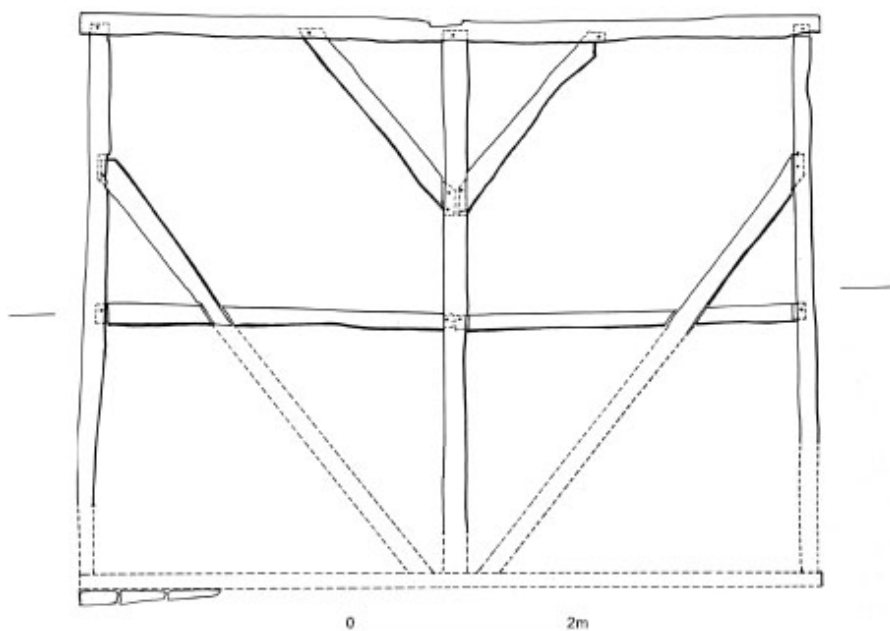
No. 41a Bridge Street: the north elevation reconstructed. The original framing of this back wall was insubstantial: apart from the first-floor girding beam and the bay post there were just two pairs of angled braces between the corner posts. It is assumed that the staves of the panel infills must have been relatively substantial
